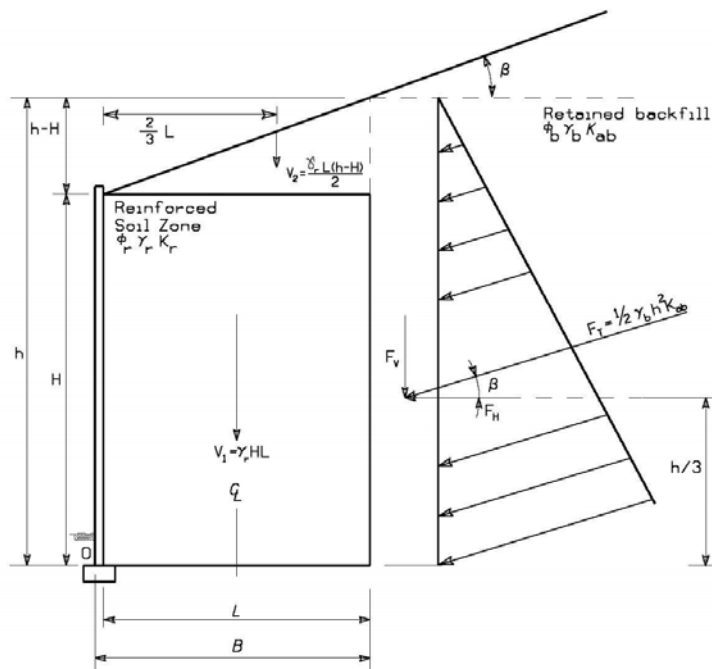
42 Force diagram of retaining wall for sliding analysis: sloping backfill case
